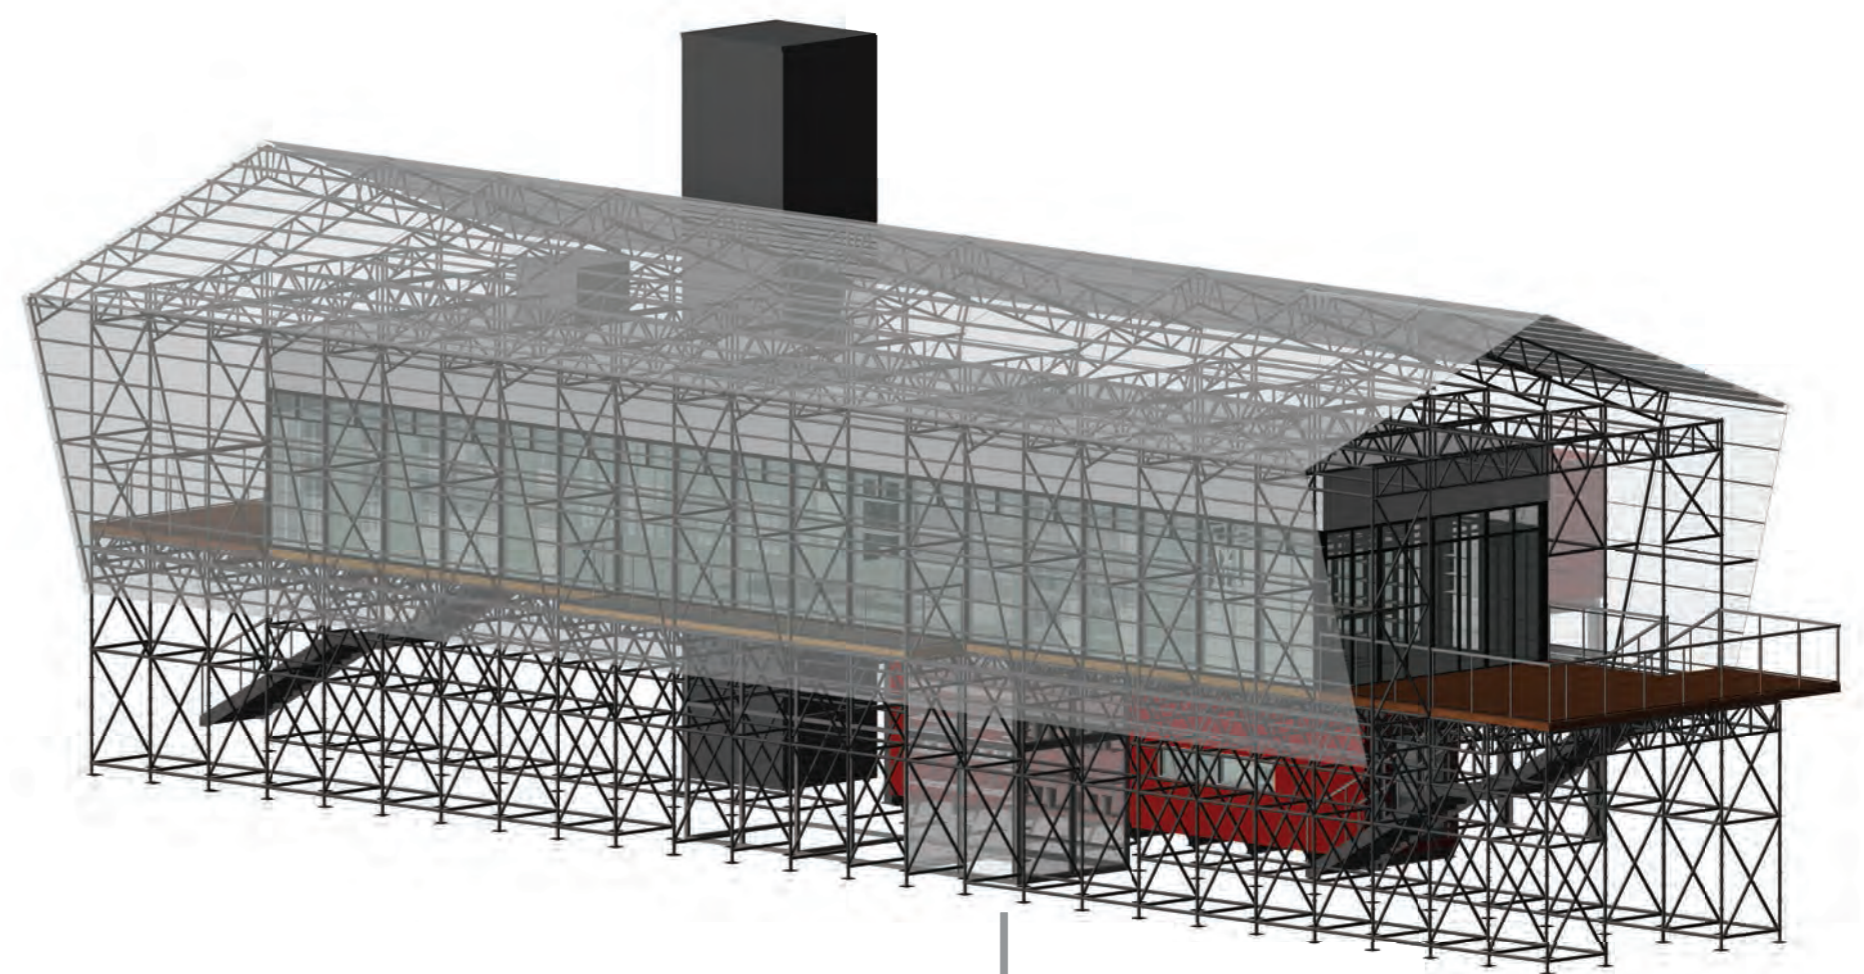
ALTERED BUILDING EXTERIOR VIEW
